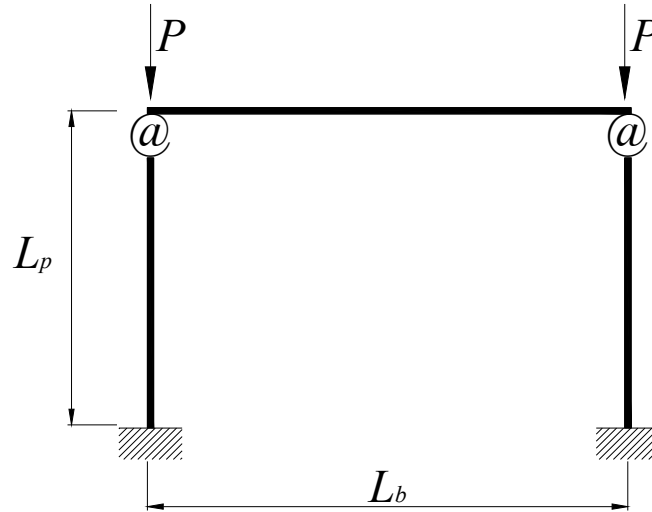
Portal frame with compressed columns and semi-rigid beam-column connections.
